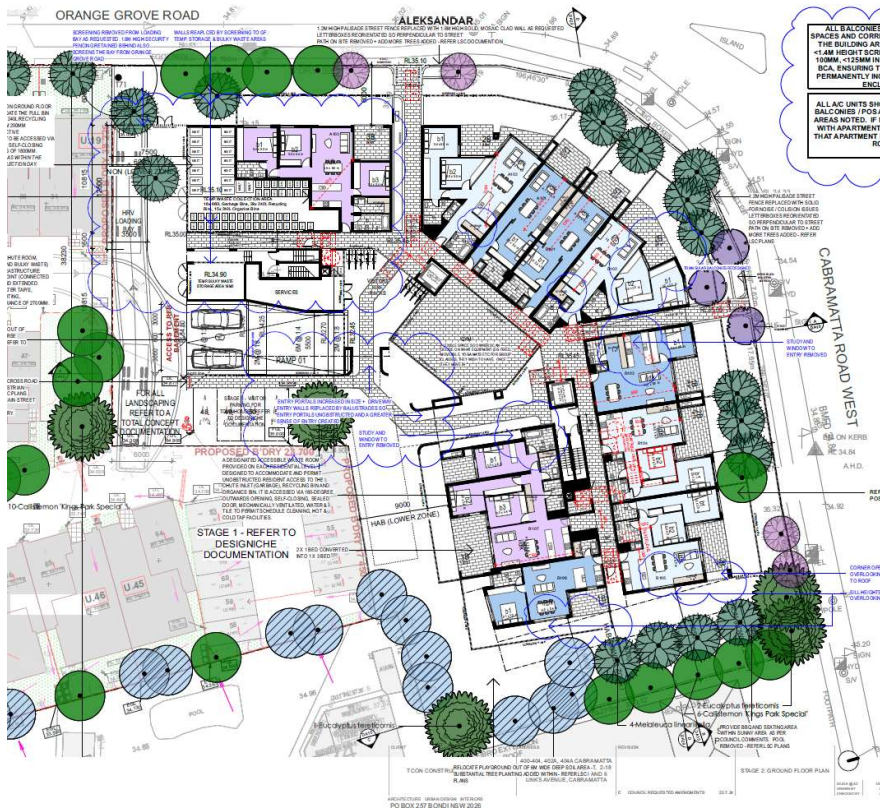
Proposed Ground Floor Plan for Stage 2 Residential Flat Building.
